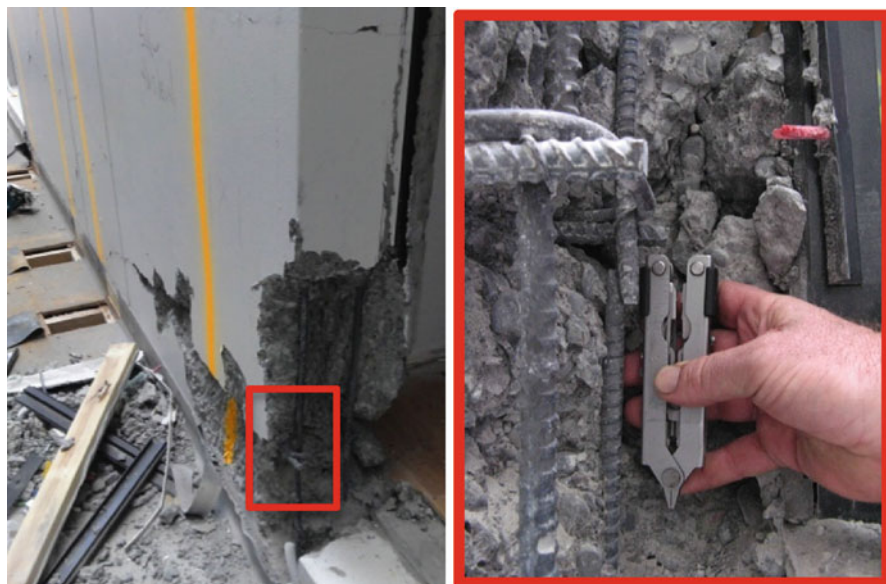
Fractured bars in lightly reinforced slender RC shear wall (Photo credit: D. Bull)
